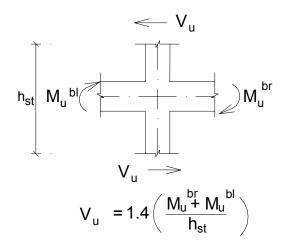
Column shear due to plastic hinge formation in longitudinal beams
